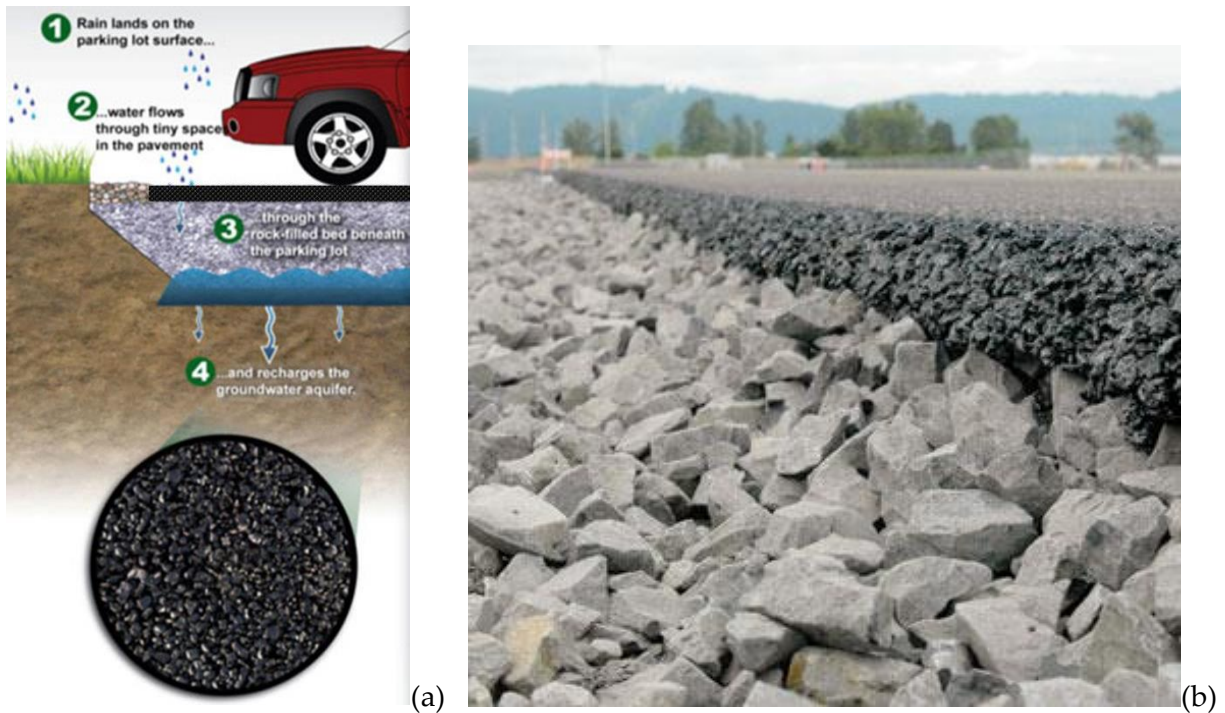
(a) Scheme of a typical porous asphalt pavement and (b) a real example [1].
